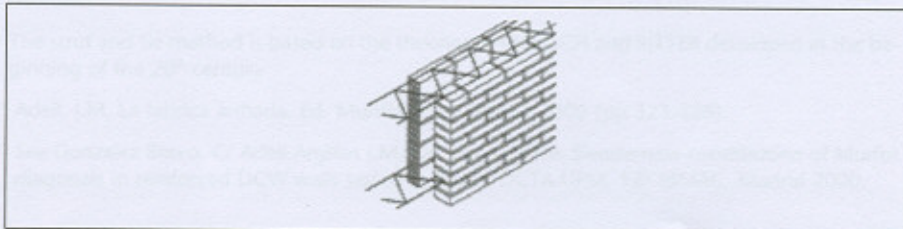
DCW wall tied with Murfor bed joint reinforcement.
